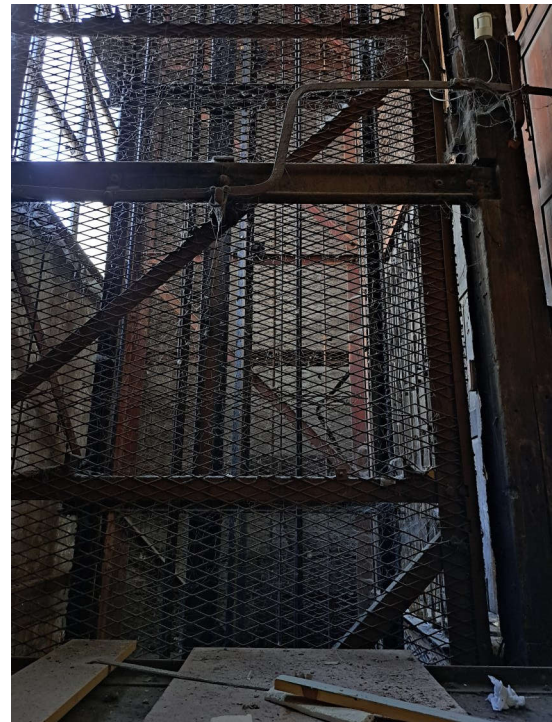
View of lift from the stairway. Taken from the first floor (FIR.2). No scale
